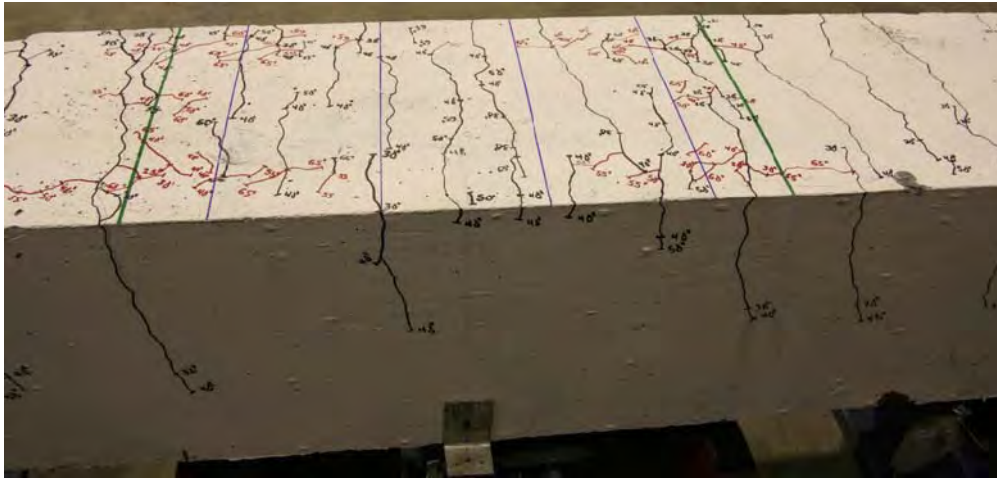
Photo. Side and top face of Beam B11-ST before failure.
